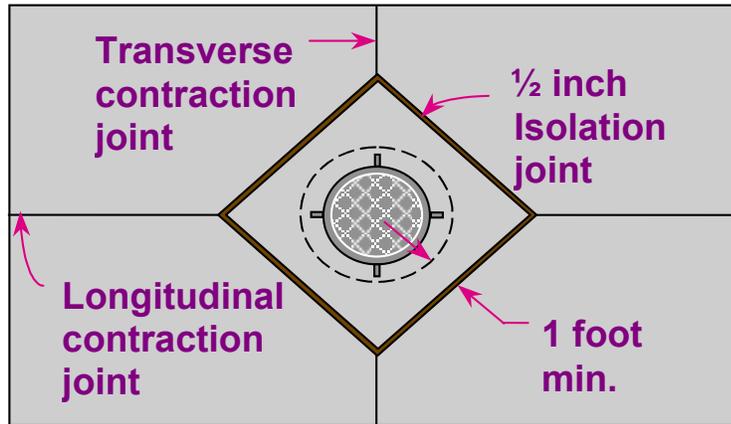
Example of a manhole boxout with intersection jointing (figure courtesy of American Concrete Paving Association).
